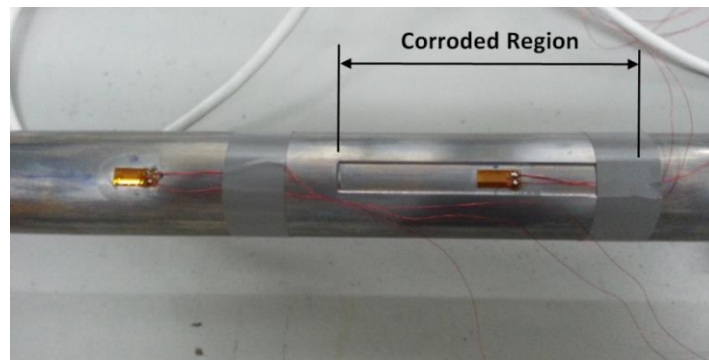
, Machined corroded region and location of the two strain gauges
